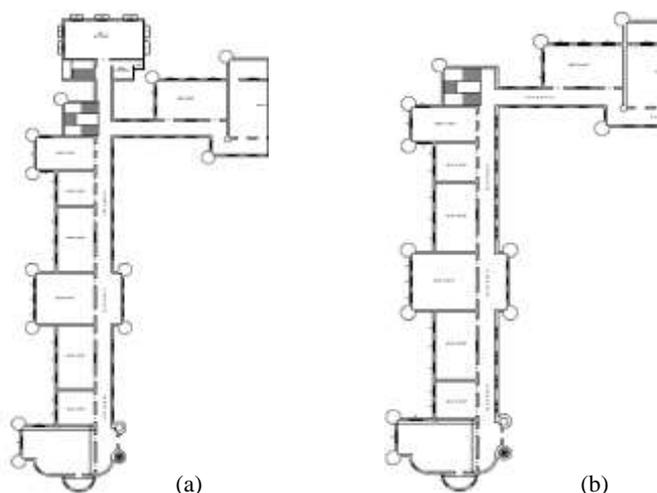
(a) Ground Floor Plan of North-East Wing (b) First Floor Plan of North-East Wing
